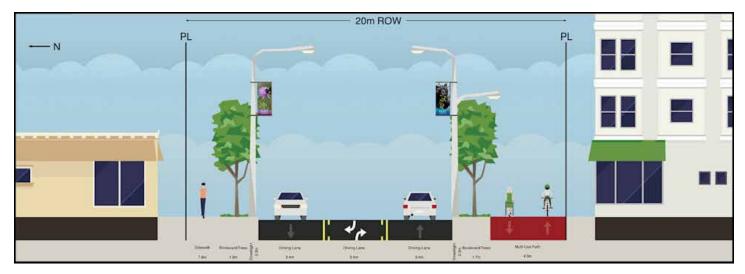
Kingsway Avenue Corridor - Typical Section with Shared Centre Turn Lane
